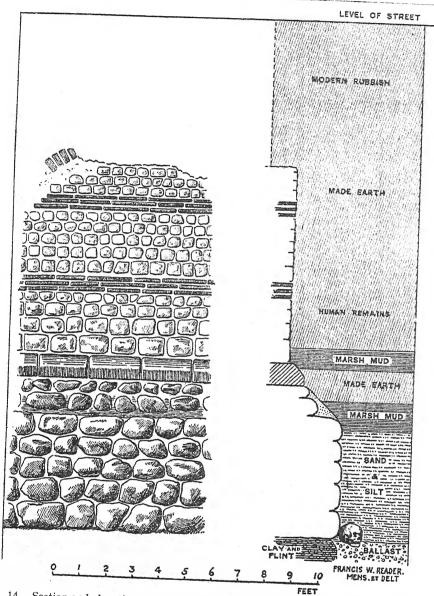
Section and elevation of wall, opposite Carpenter's Hall. From Archaeologia, L.N.
